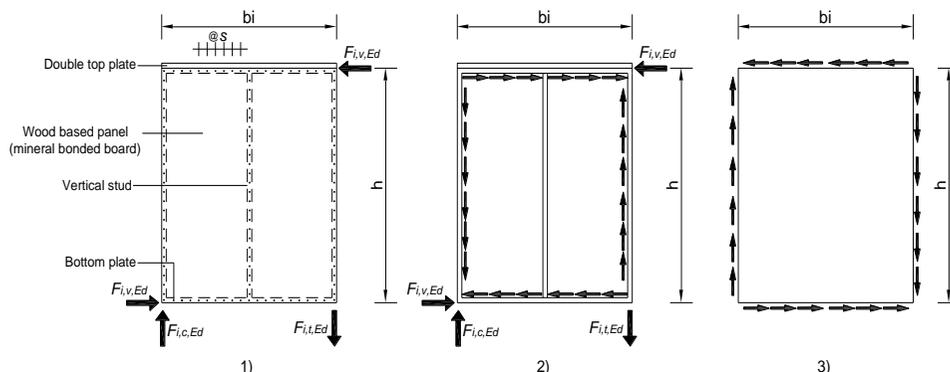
Loads and forces acting on wall panel (1), framing (2), and sheet (3) [1]
